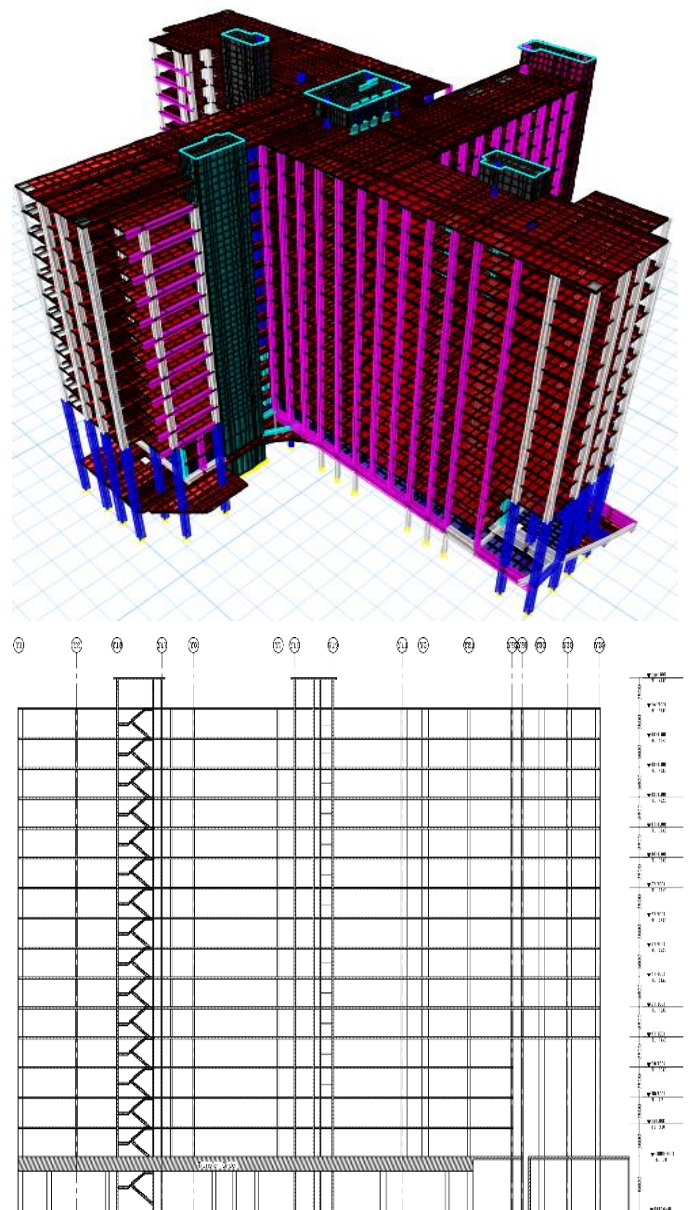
3D Model with transfer girders at 10% of total height and cross-section elevation.
